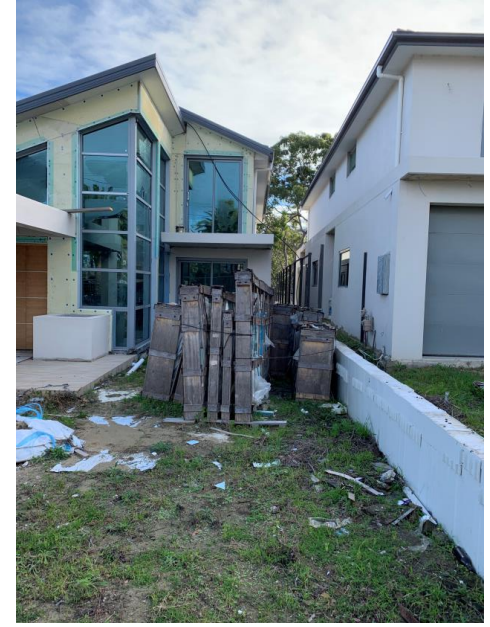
Street view looking south-west at 1178 Forest Road, main dwelling and basement garage containing surface water.
